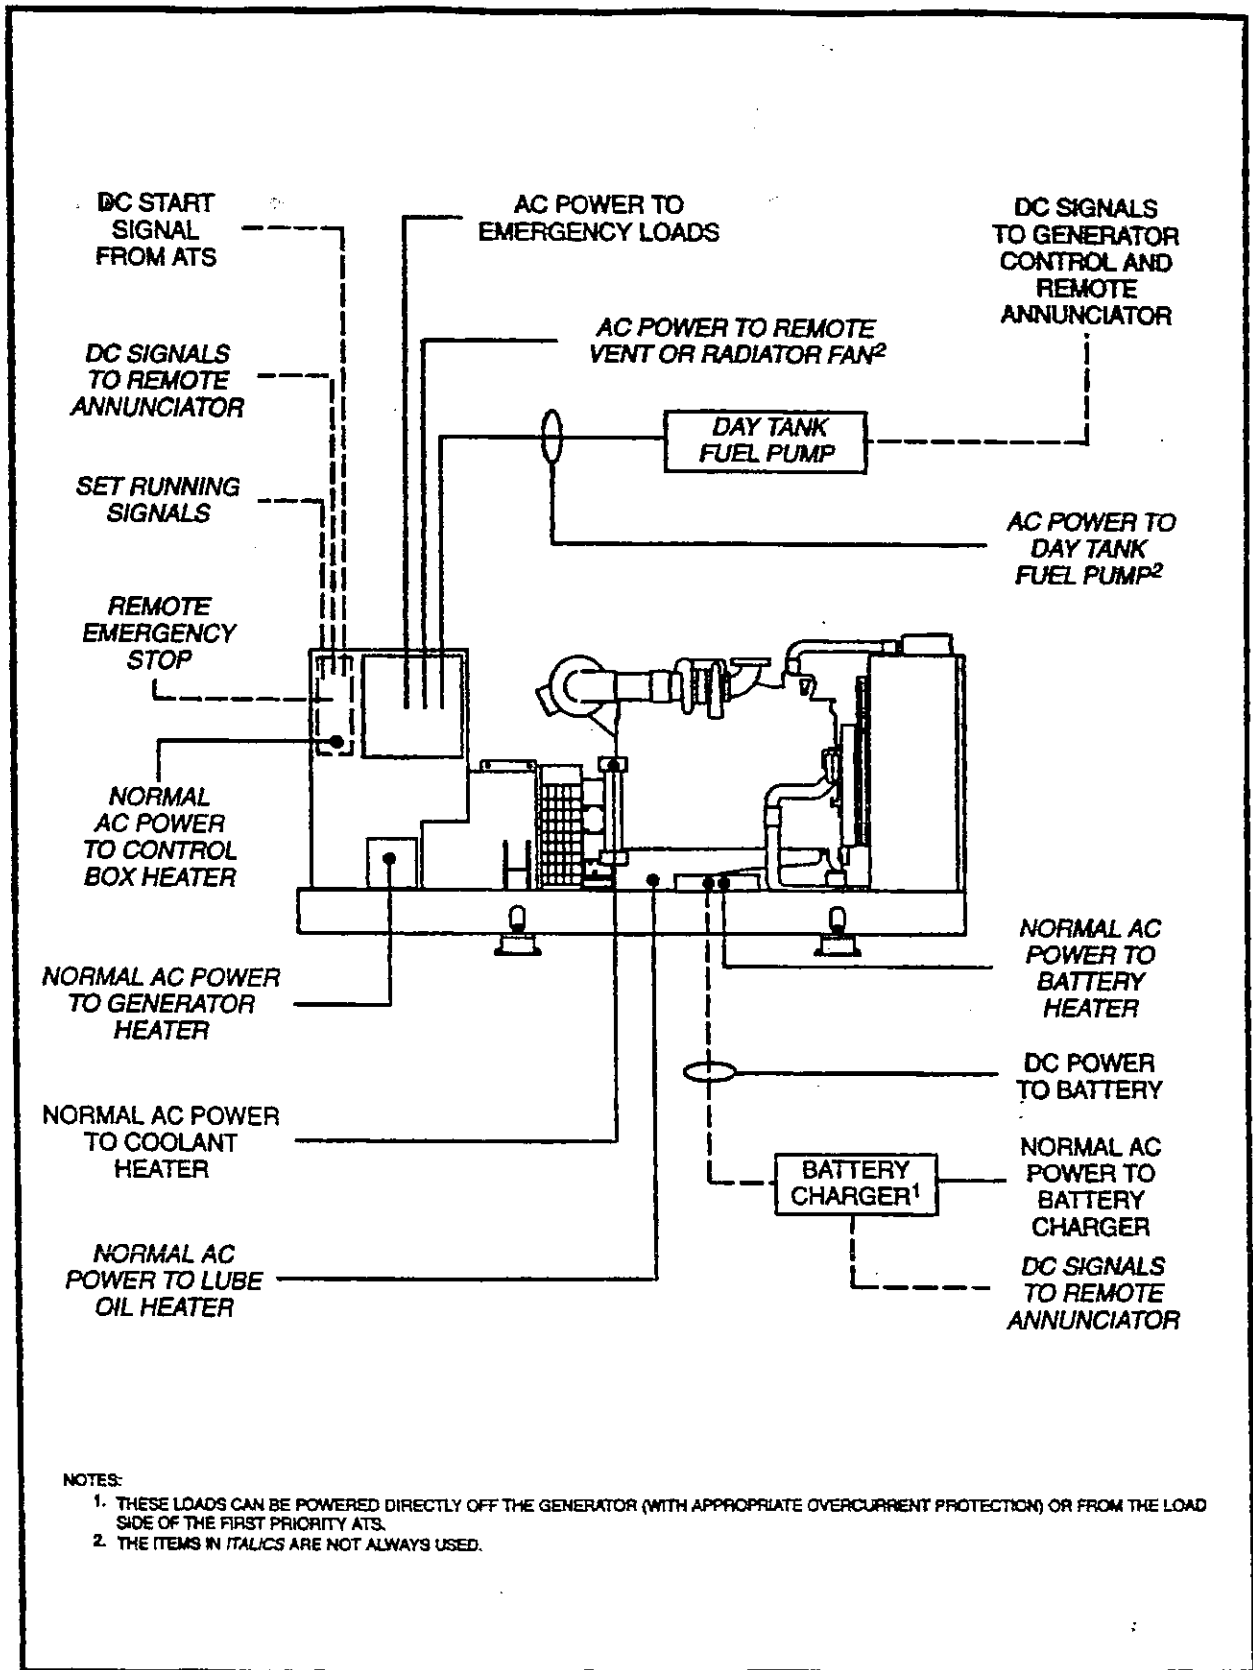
TYPICAL GENERATOR SET CONTROL AND ACCESSORY WIRING
